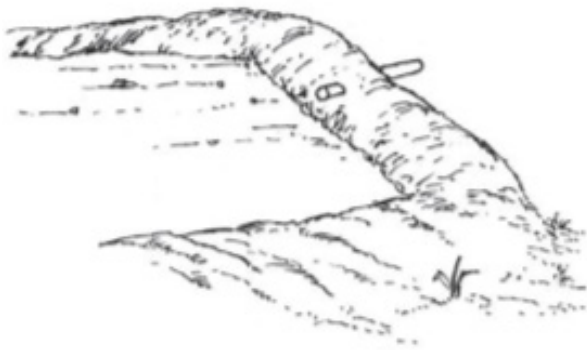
an overflow pipe with a 30cm freeboard Fig 3.31 a PVC pipe or bamboo used as inlet or outlet pipes
